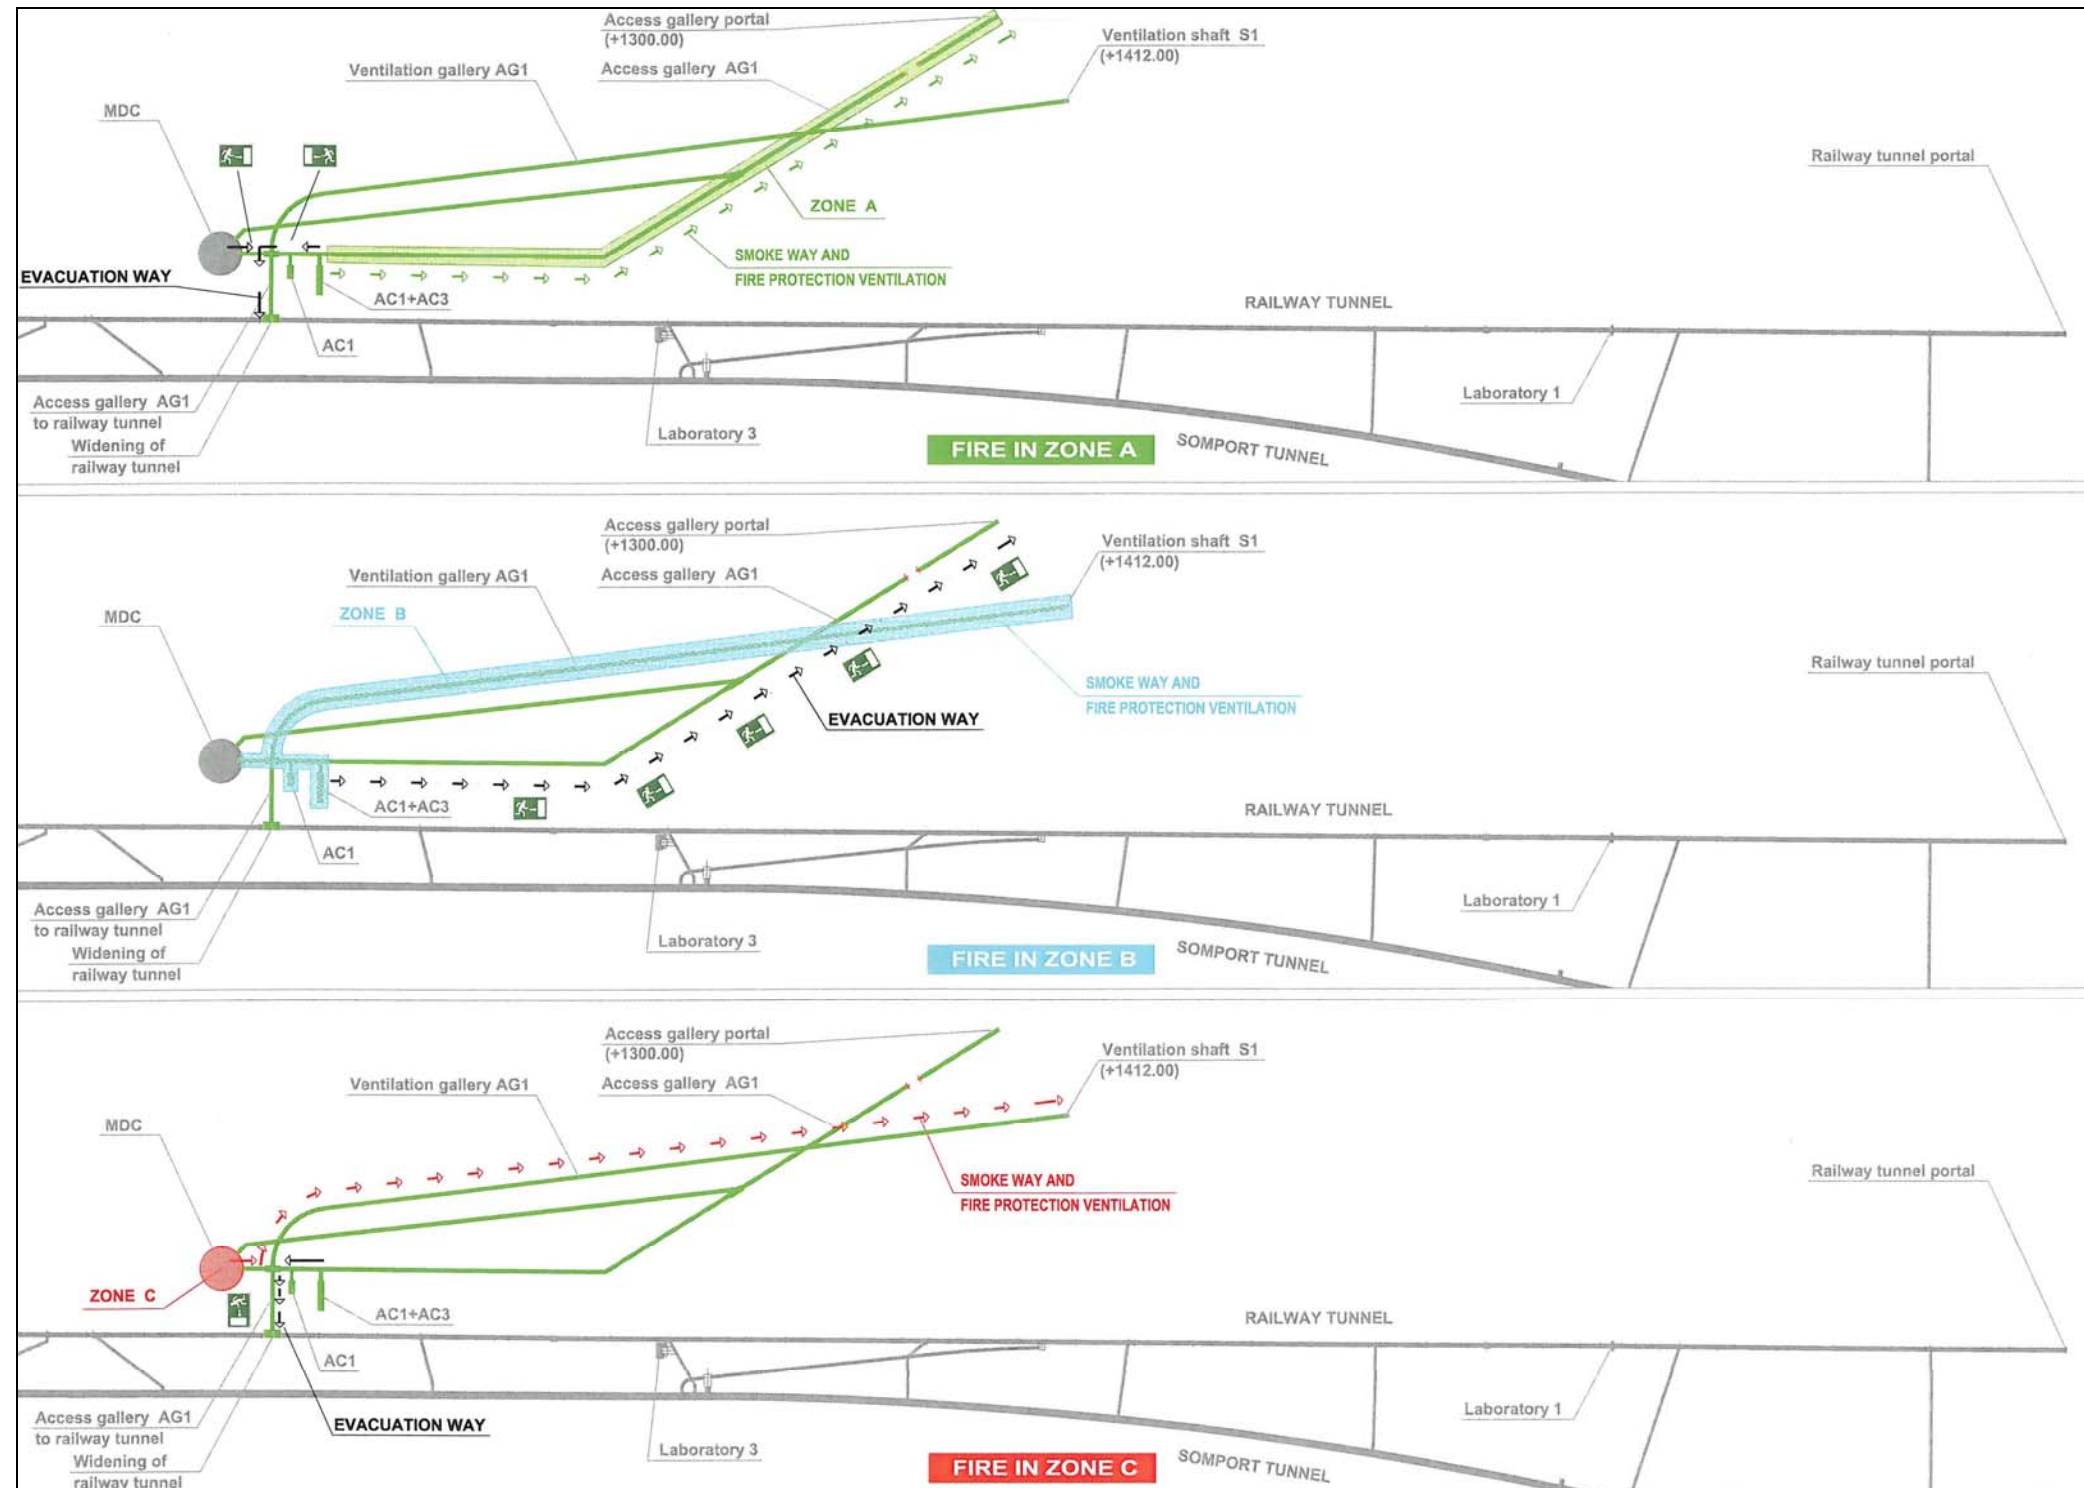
Evacuation plan and fire protection ventilation system.
